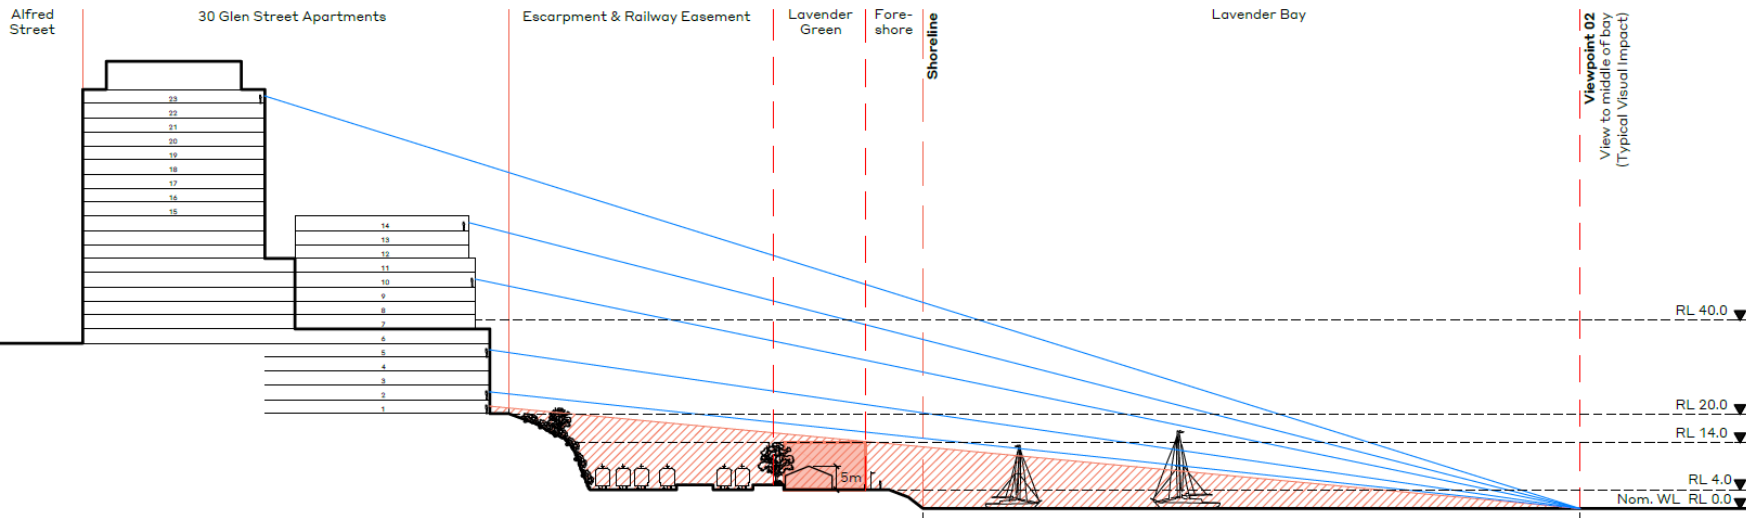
View corridor through Lavender Green to the centre of Lavender Bay, showing the proposed building envelope
